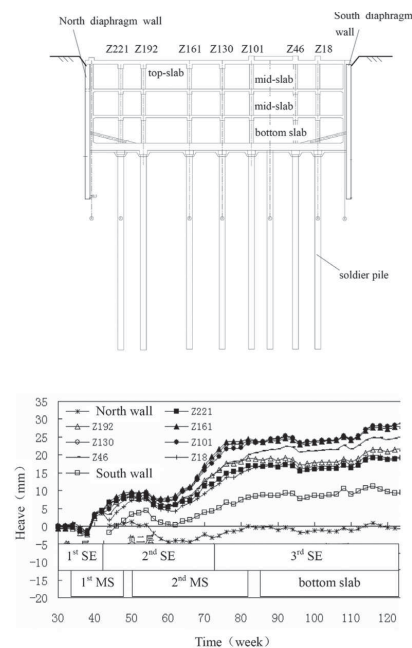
Profile of excavation using top-down construction and monitoring data showing heave of diaphragm walls and piles (n.b. SE = staged excavation, MS = mid-span construction) (from Zheng and Li).
